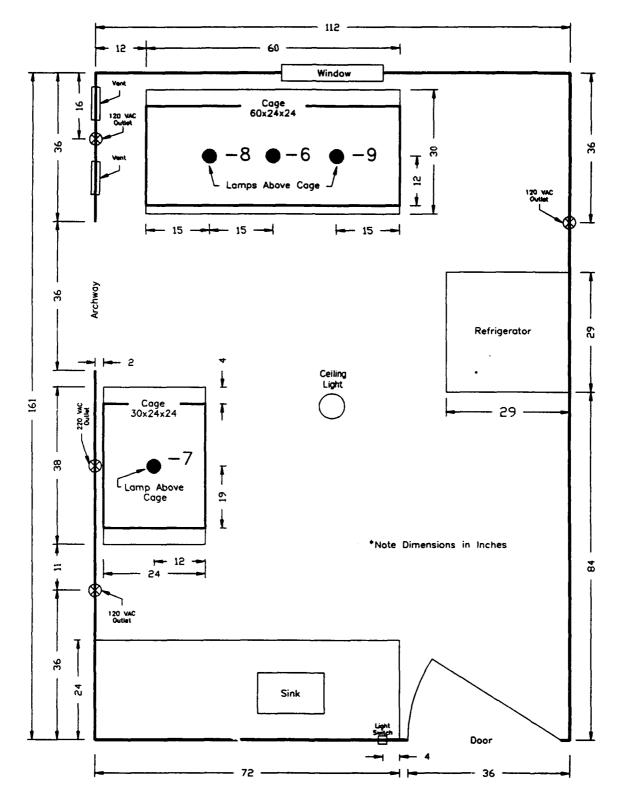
MEASUREMENT POINTS AT CRYSTAL FALLS LABORATORY, 2ND FLOOR WORK AREA; 2L1-6 THROUGH 9.
